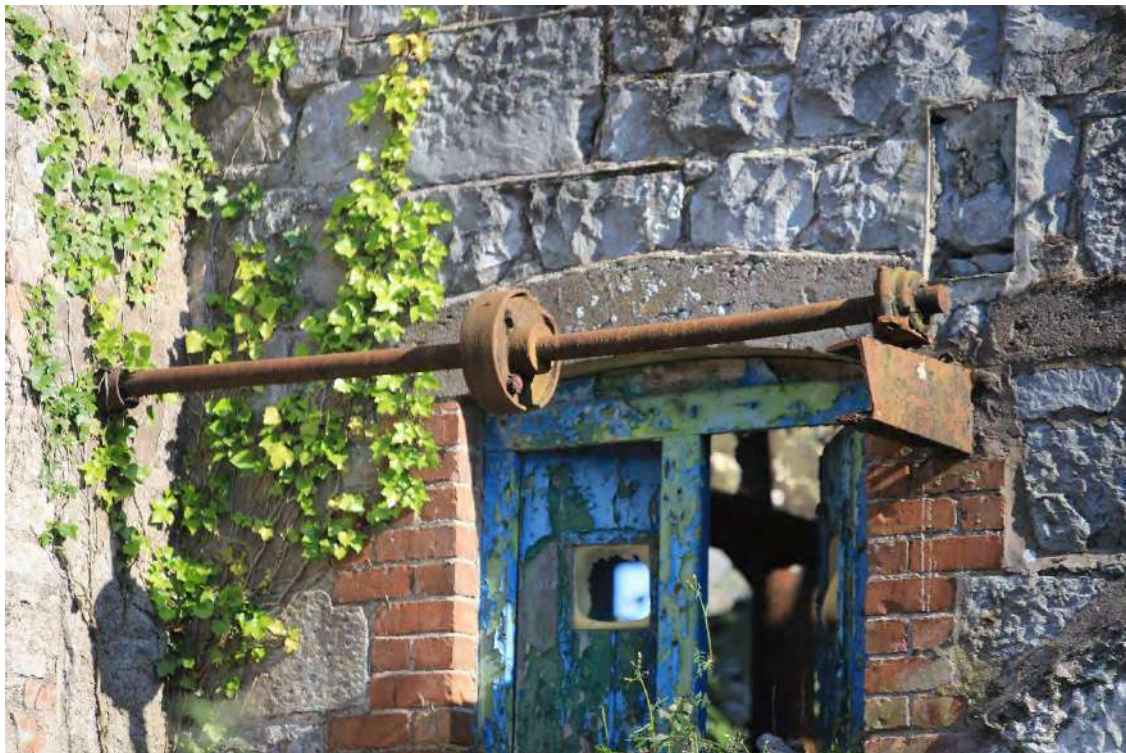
Surviving portion of north-facing elevation of 1900s maltings, showing use of brick in upper storey.
